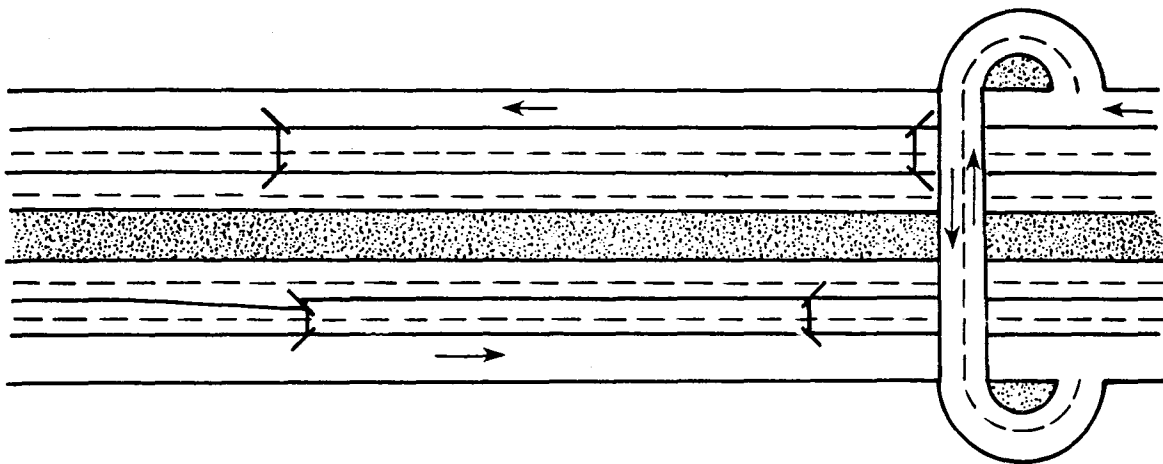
Proposed One-way, One-lane Frontage Road with Exclusive Truck Facility
